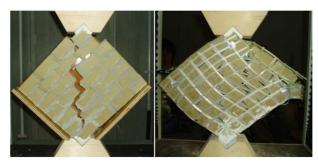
Failure patterns of unburned brick masonry wallettes (left) with retrofitting (right) without retrofitting (11)
